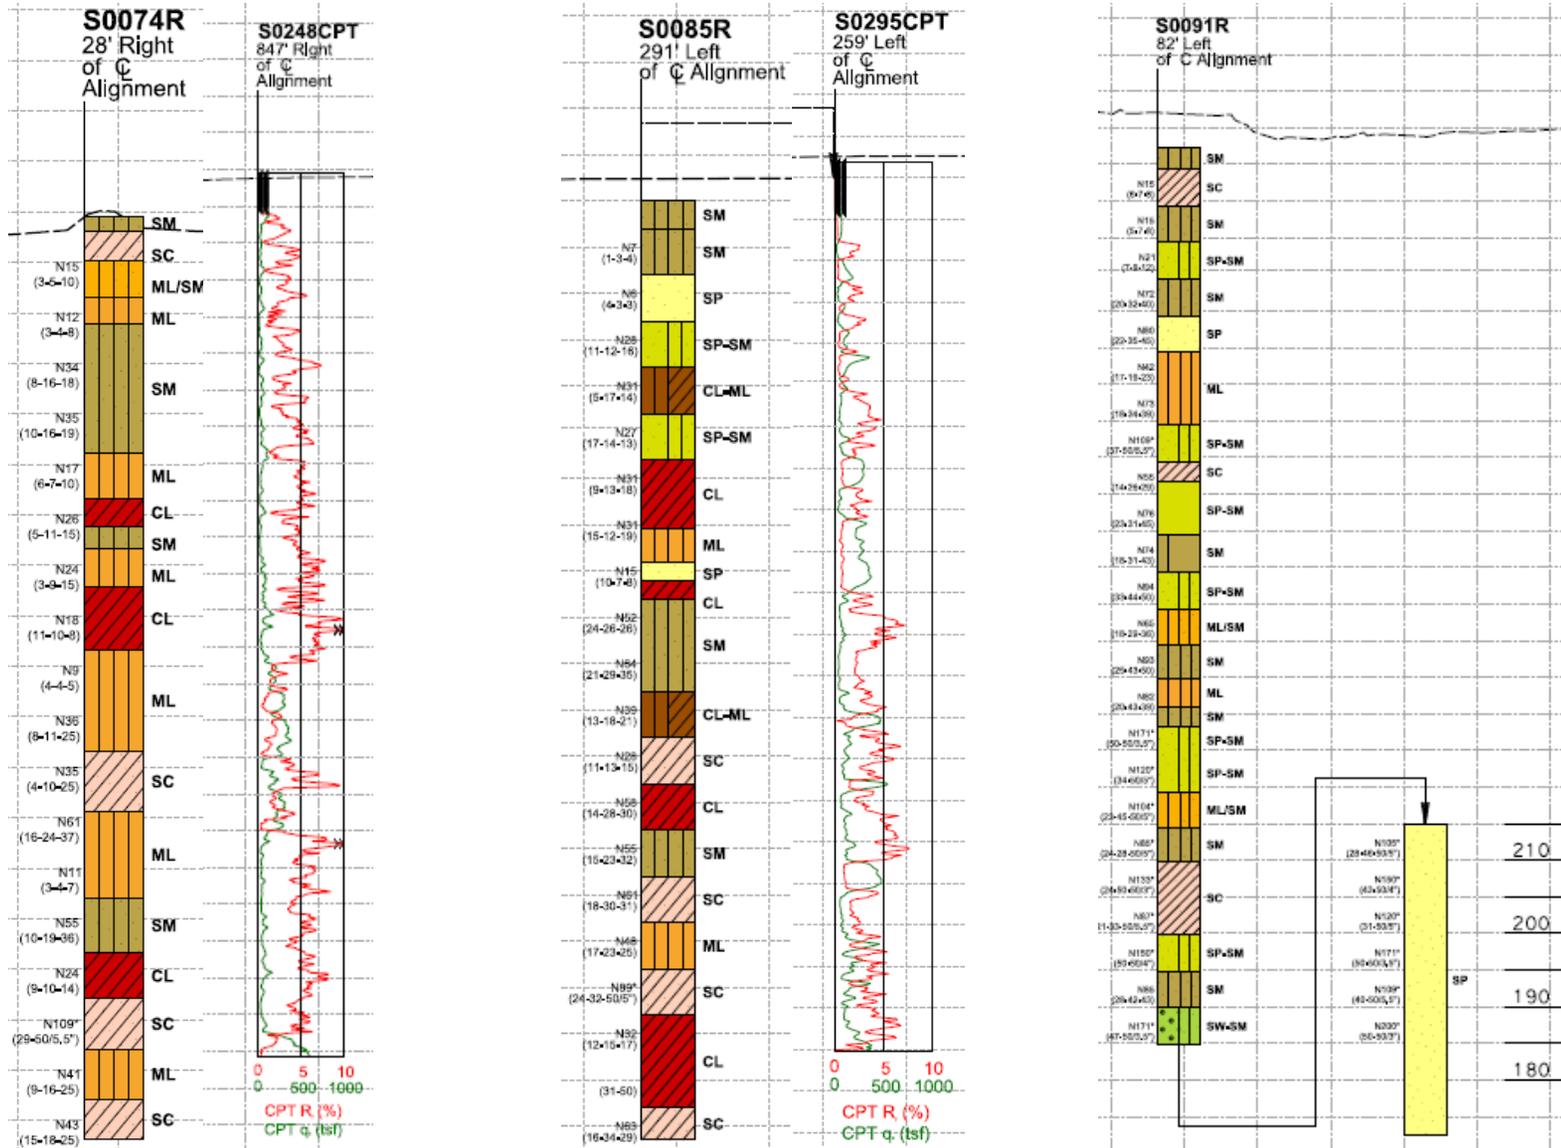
Soft to Stiff Soil Profiles for Construction Package 4
